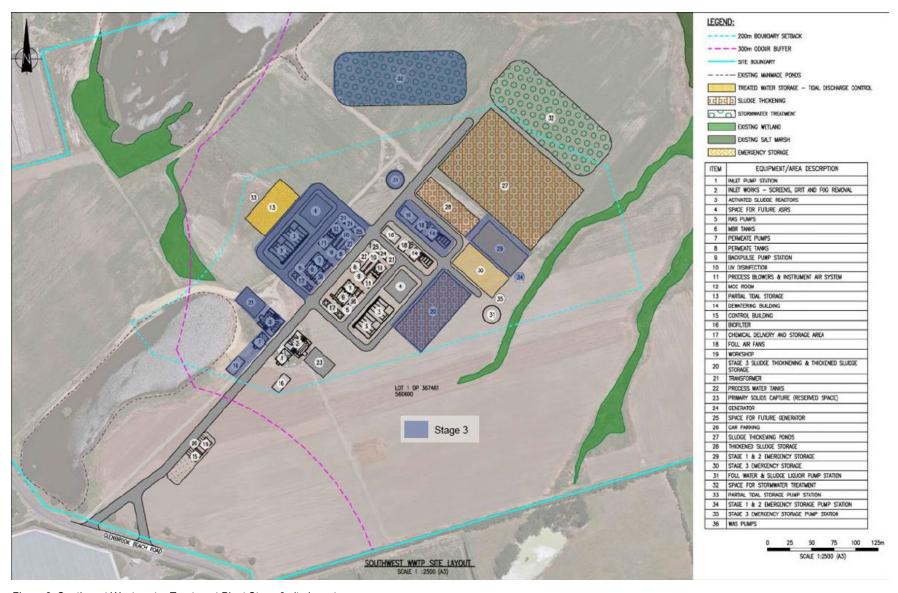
Southwest Wastewater Treatment Plant Stage 3 site layout
